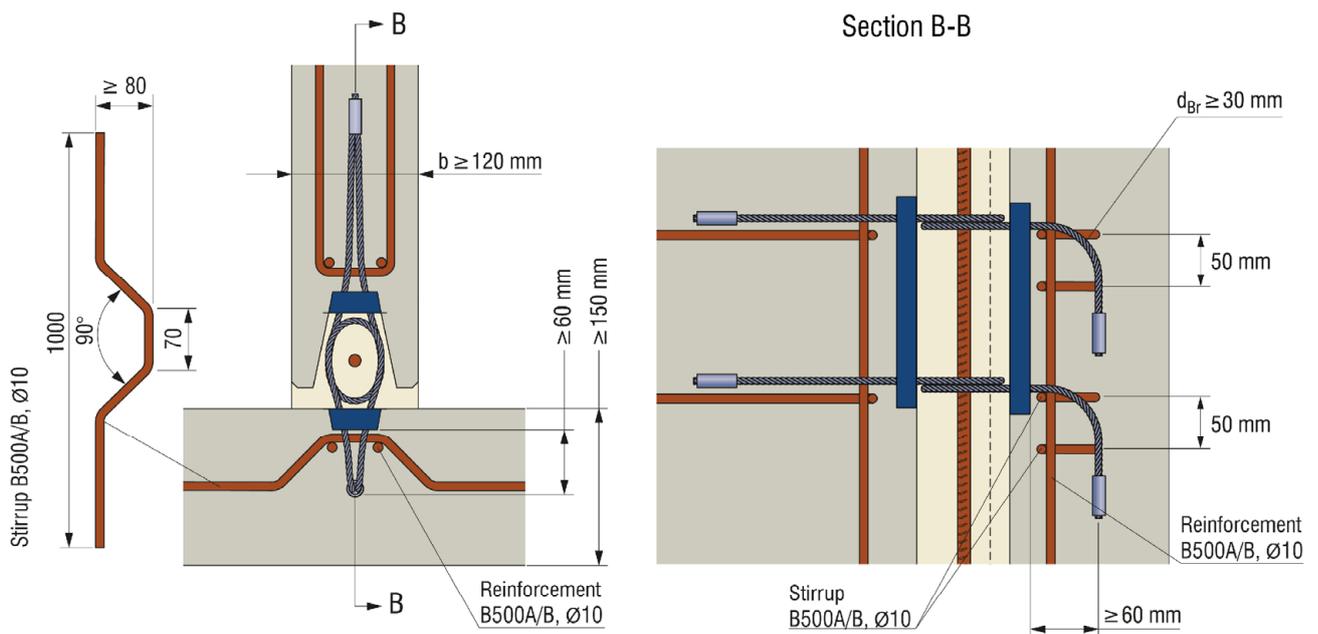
Wall – Wall – T-Connection - Detail with bended wire loops
